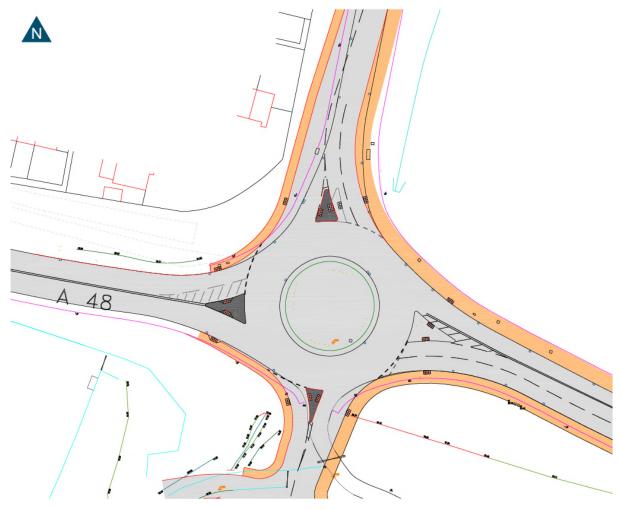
Potential modifications to the existing A48 Bypass Road/B4622 (Broadlands) roundabout
